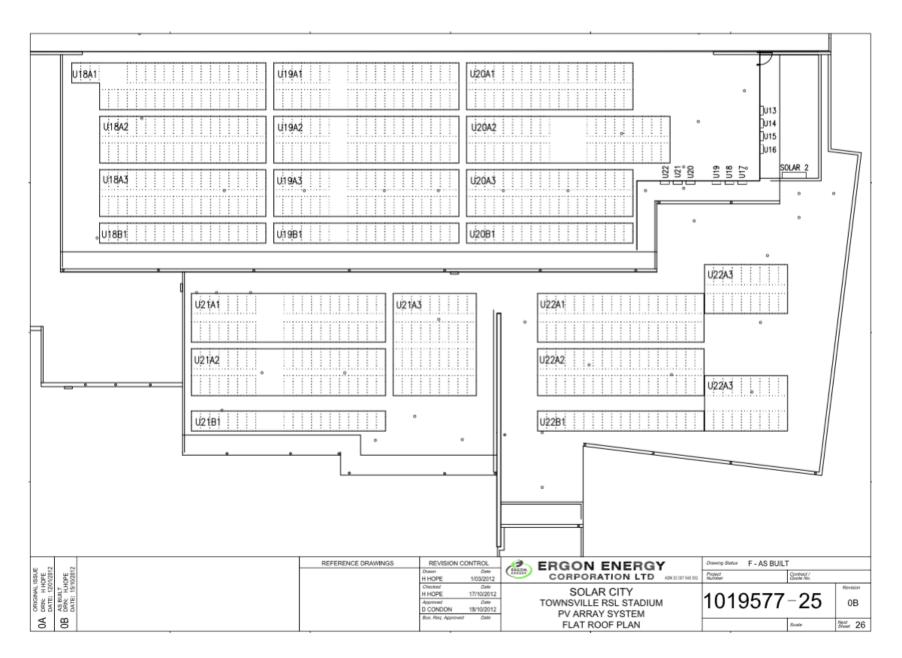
Panel and invertor layout Townsville RSL Stadium flat roof plan.
